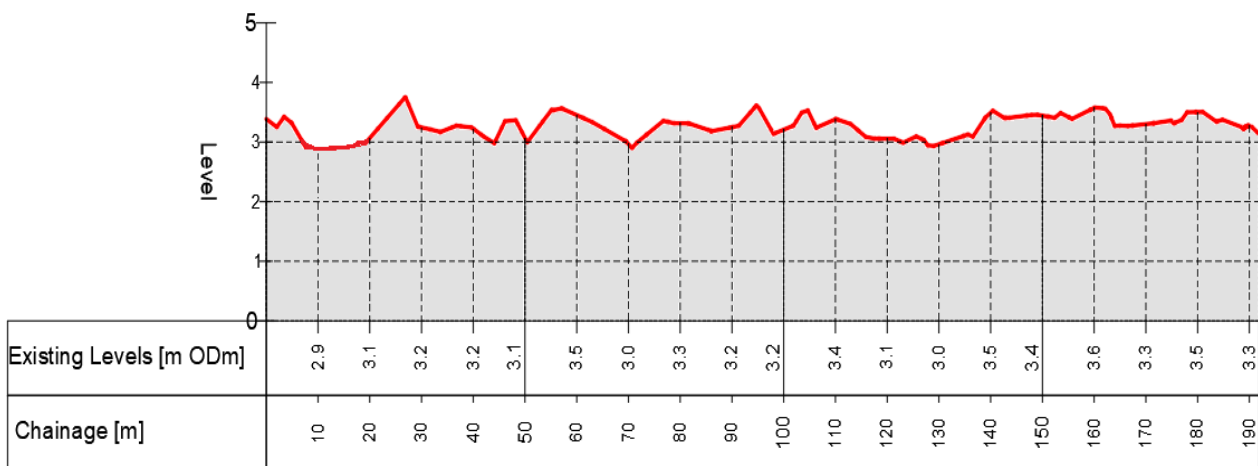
Long-section of the sheet piling at Burrow road (levels to ODm)
